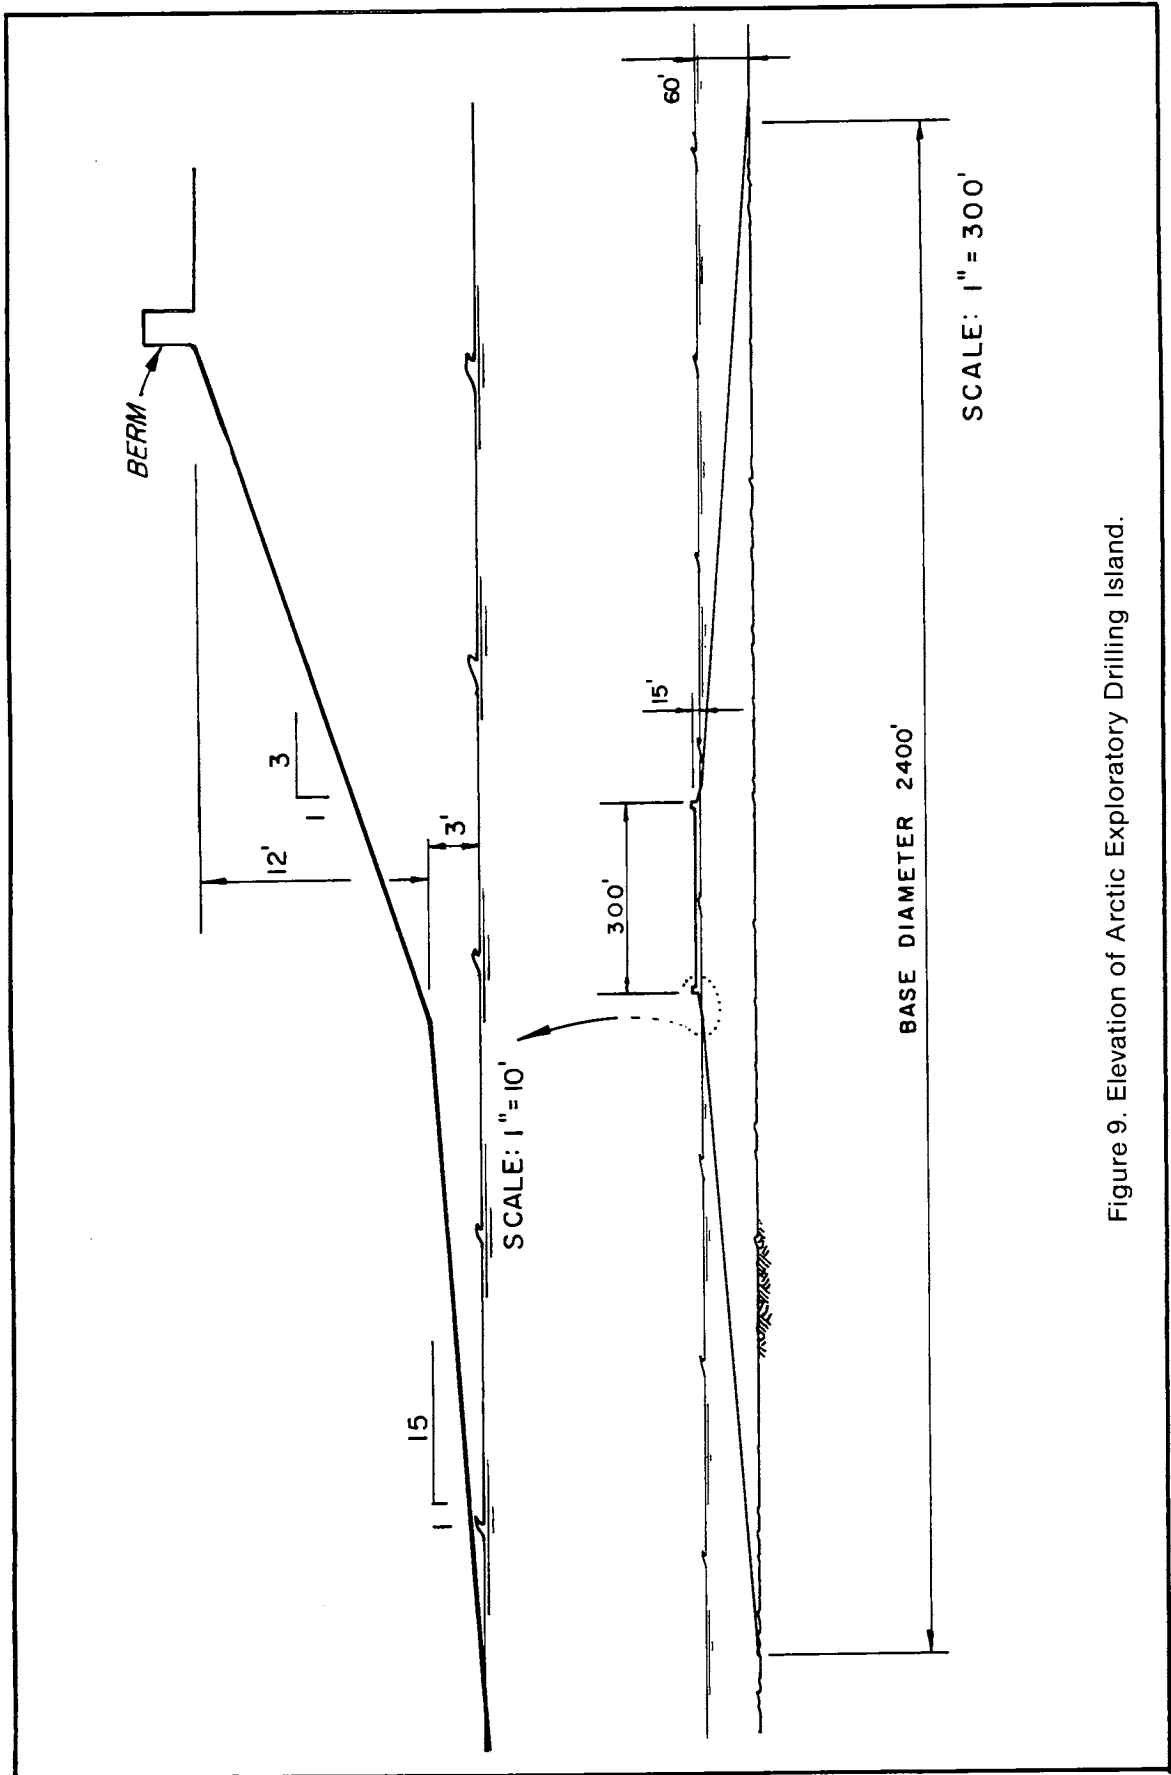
Elevation of Arctic Exploratory Drilling Island.
